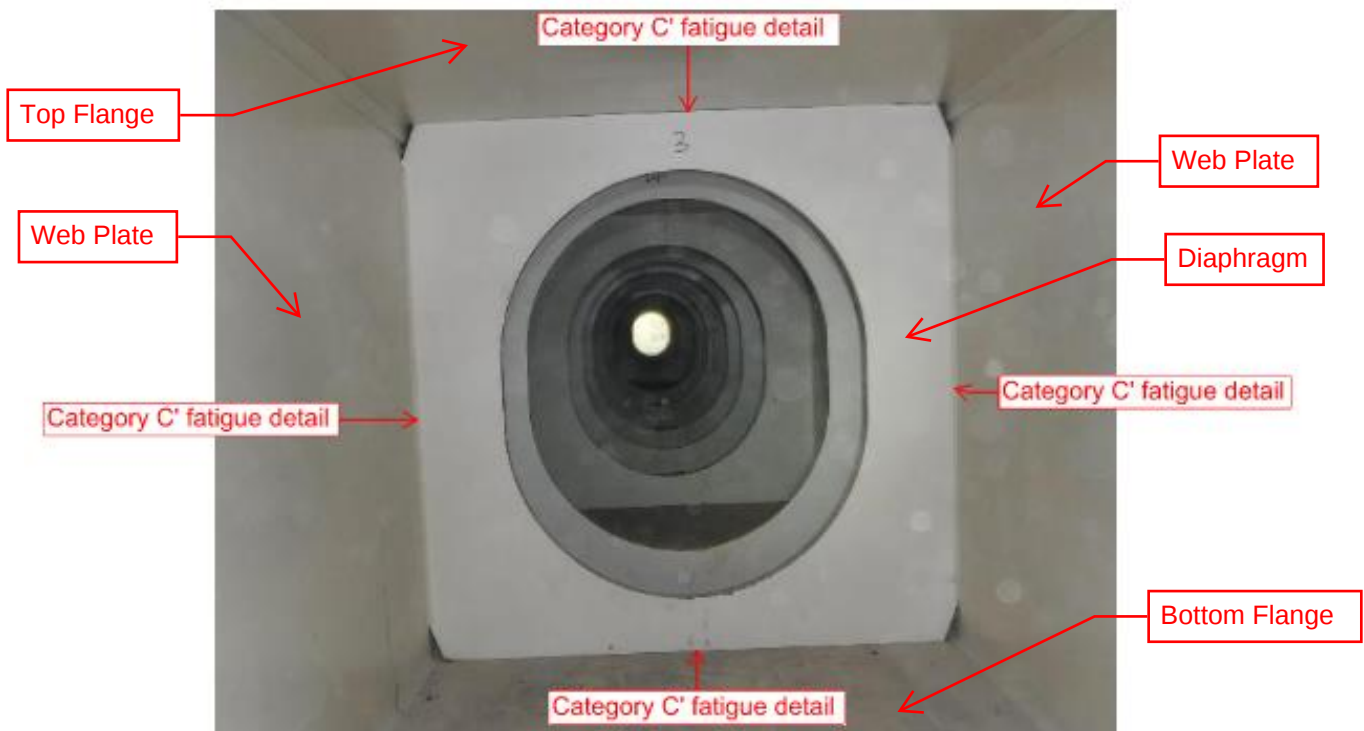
Category C' fatigue detail - Diaphragm fillet welds to webs and flanges
